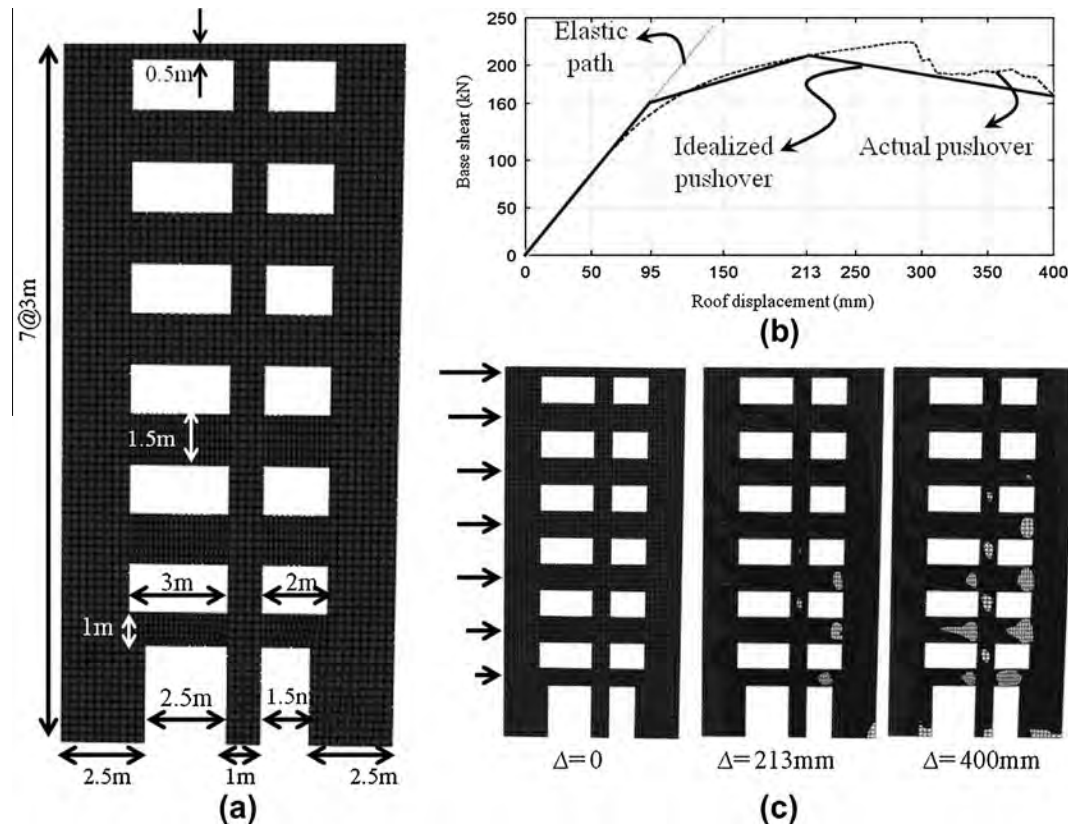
(a) Building dimensions, (b) pushover curve of the building, and (c) damage states of the building, Δ stands for roof displacement.
